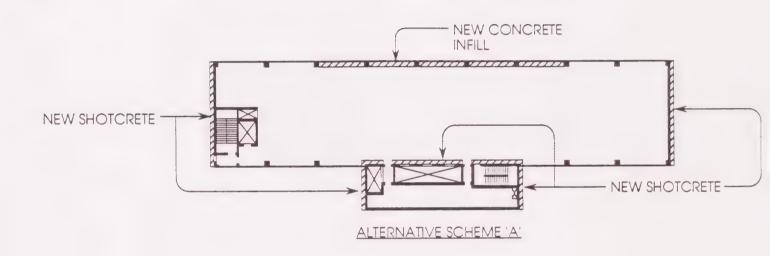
Alternative Retrofit Scheme A-Typ. Tower Floor
